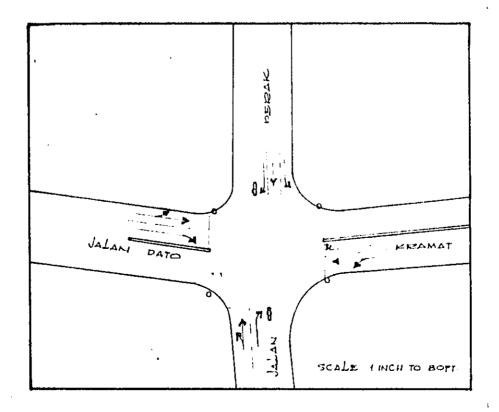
TYPICAL LAYOUT OF INTERSECTION
